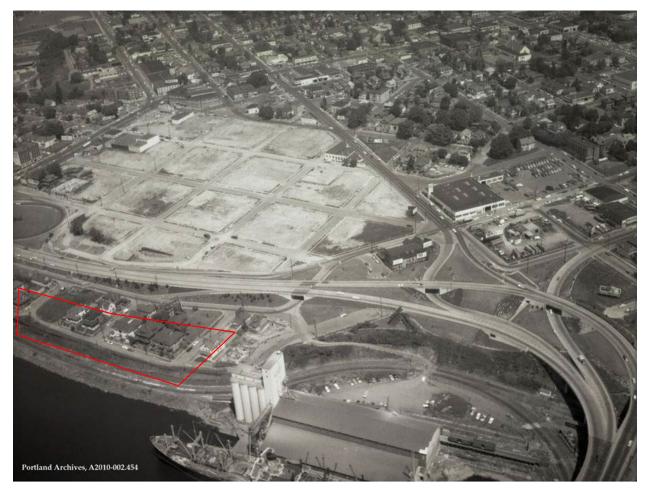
1962 aerial photograph of freeway construction looking north from Banfield Freeway connections, just north of Revised Built Alternative Area C (City of Portland 2022g). Red polygon at center right delineates approximate location of Area A along NE Holladay Street, and center left the location of Area B with the Thunderbird Motel having replaced former residential buildings.
